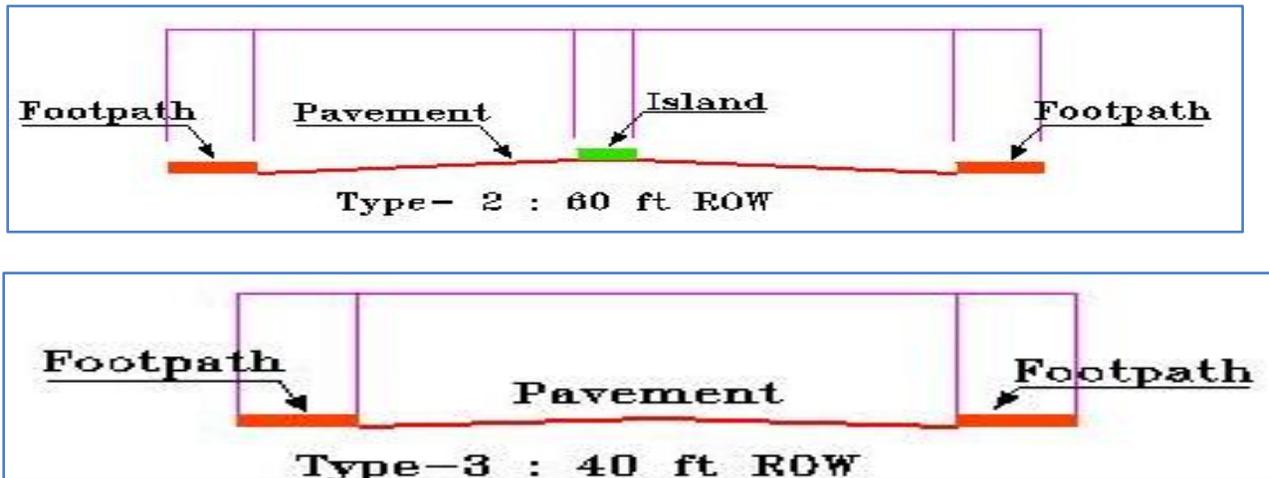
Standard Cross-Section of pourashavaSecondary Road
